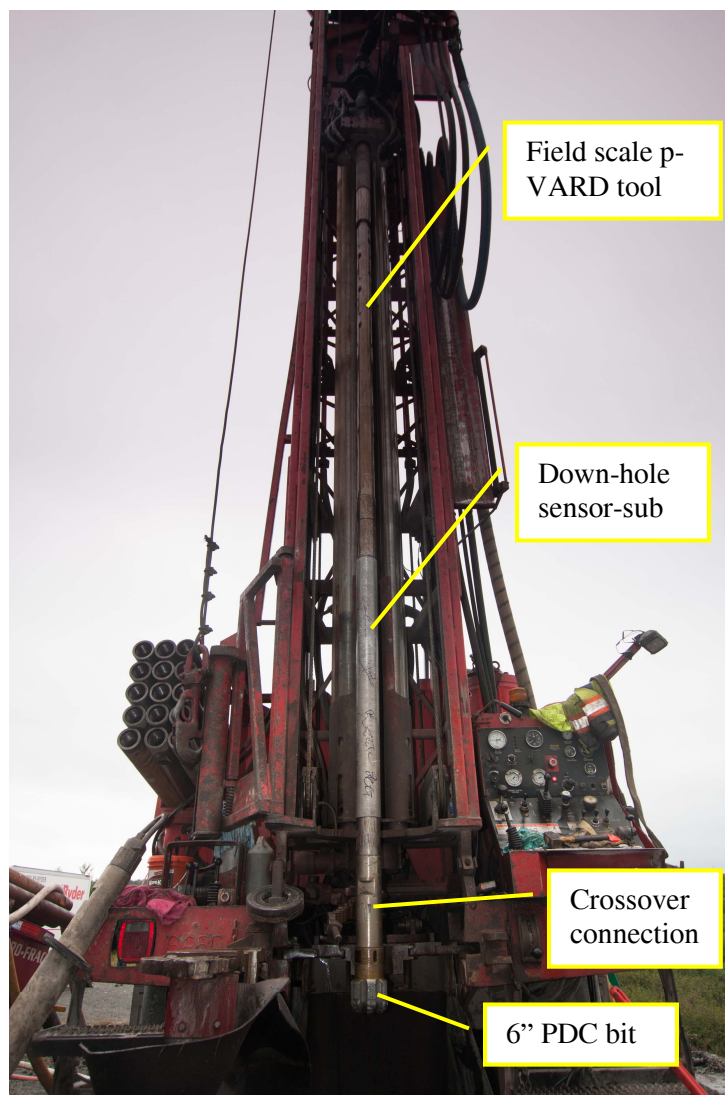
Bottom Hole Assembly (BHA) for field trials
